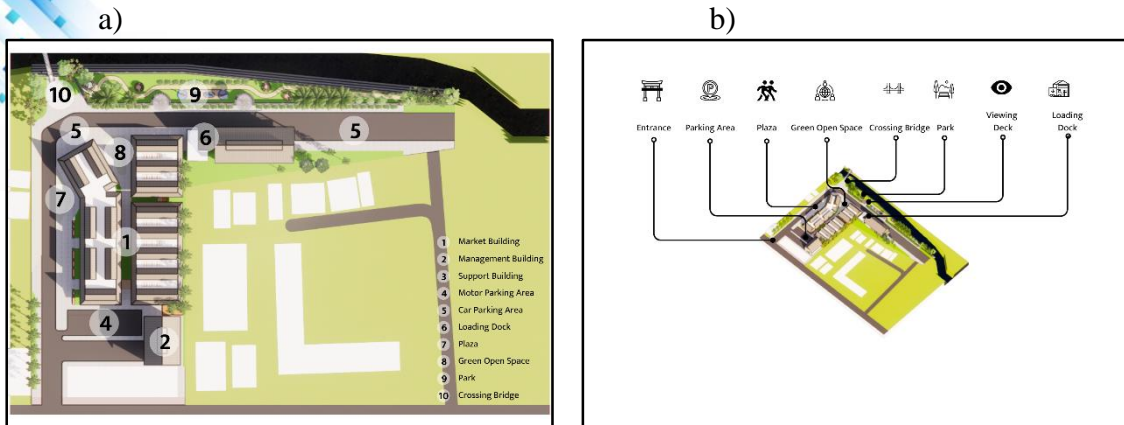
(a) Site Plan Design; (b) Site Plan Feature
